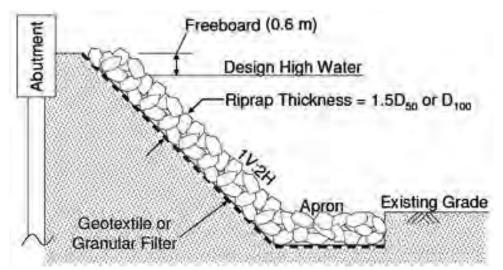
Typical of cross section for abutment riprap
